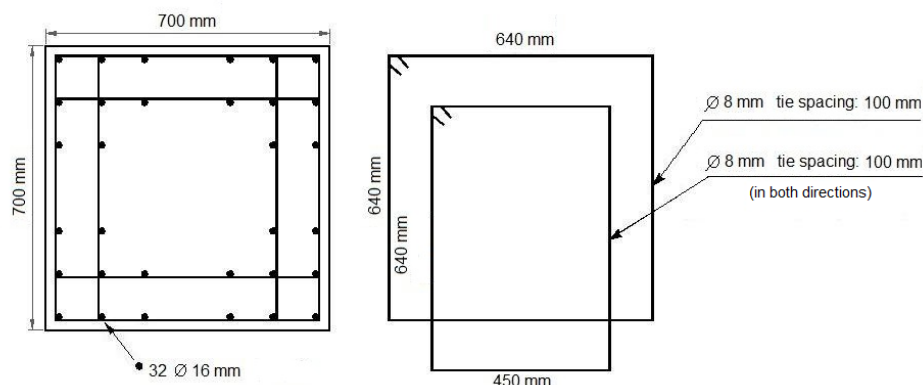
Geometry of the cross-section and reinforcement arrangement of prototype column
